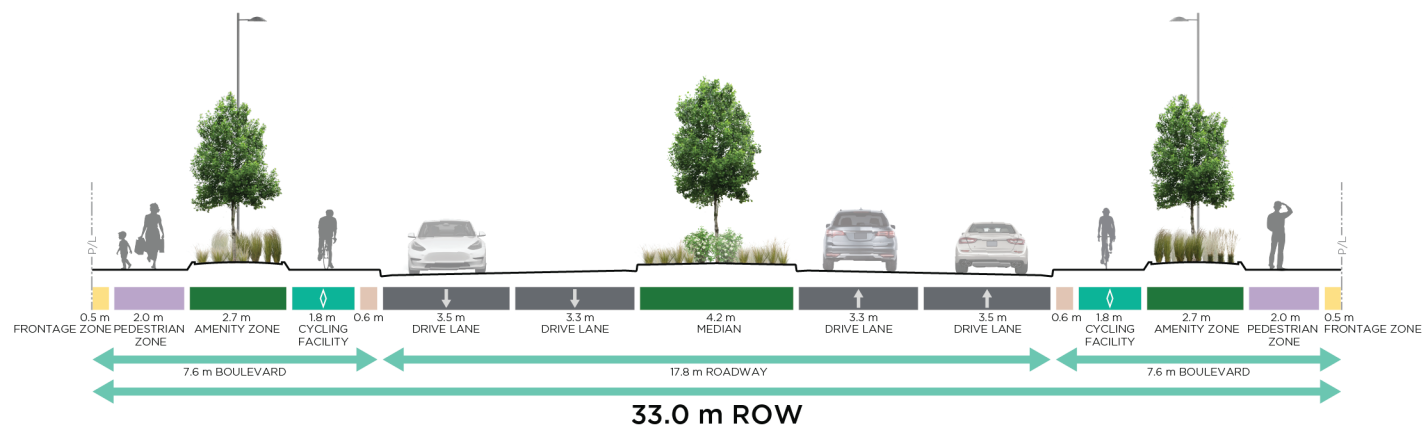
FIGURE B - JANE STREET, NORTH OF HIGHWAY 7
